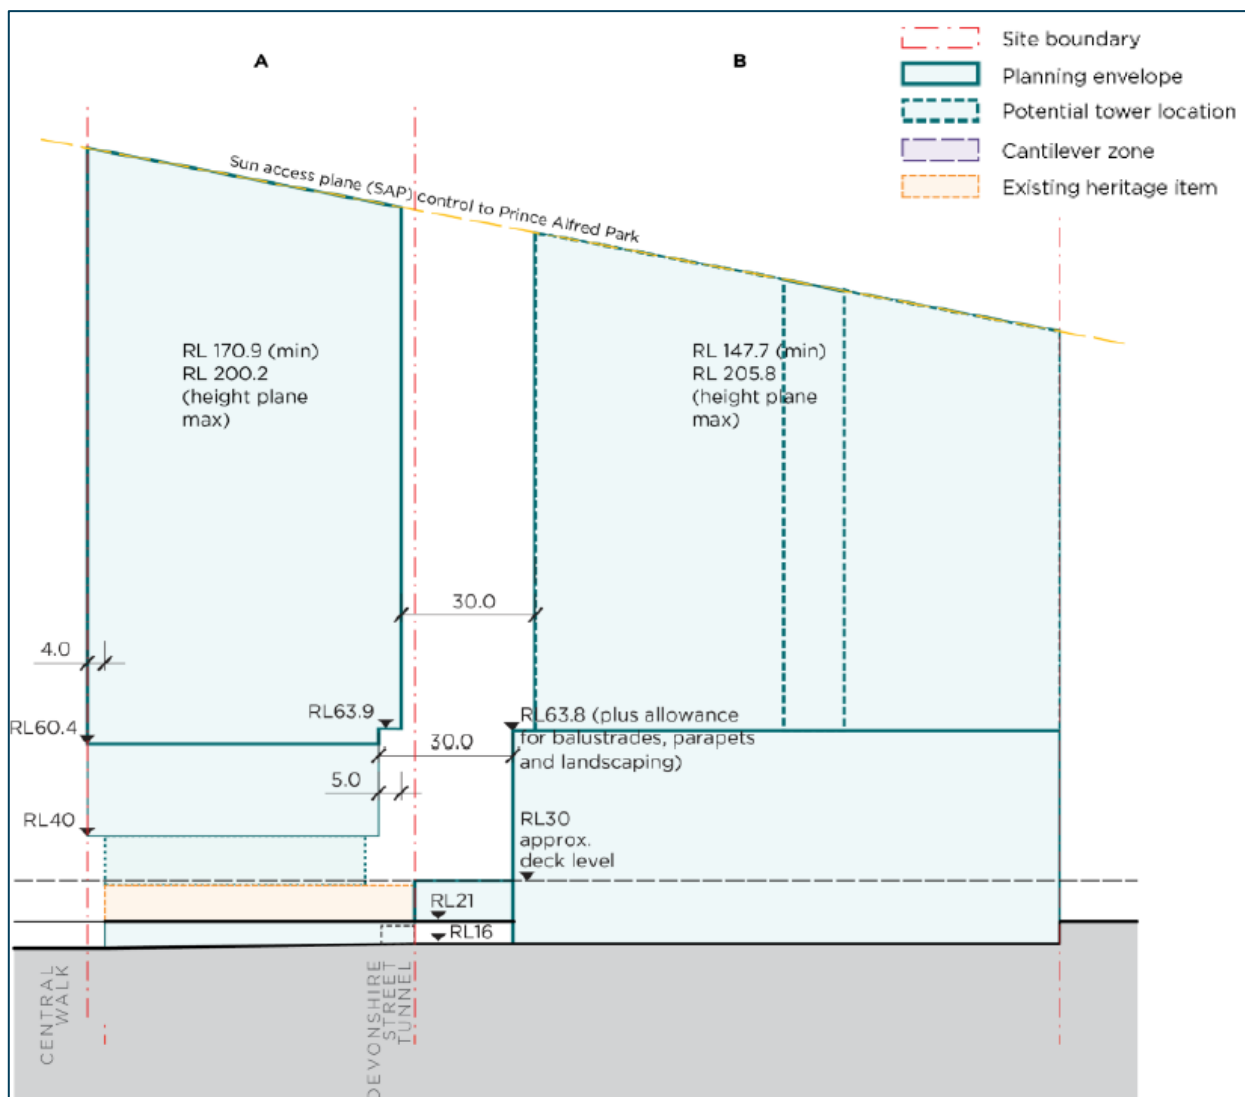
Building envelopes for Blocks A and B (north south section) (Source: WGDG)
